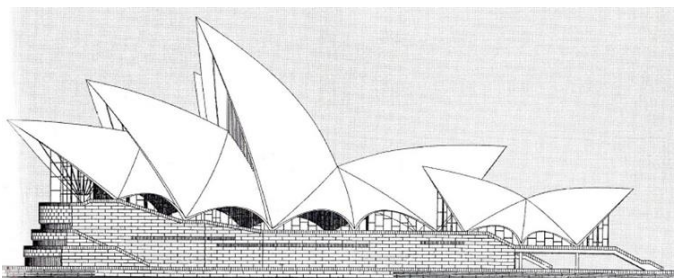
West Elevation with parabolic shell roofs and glass
